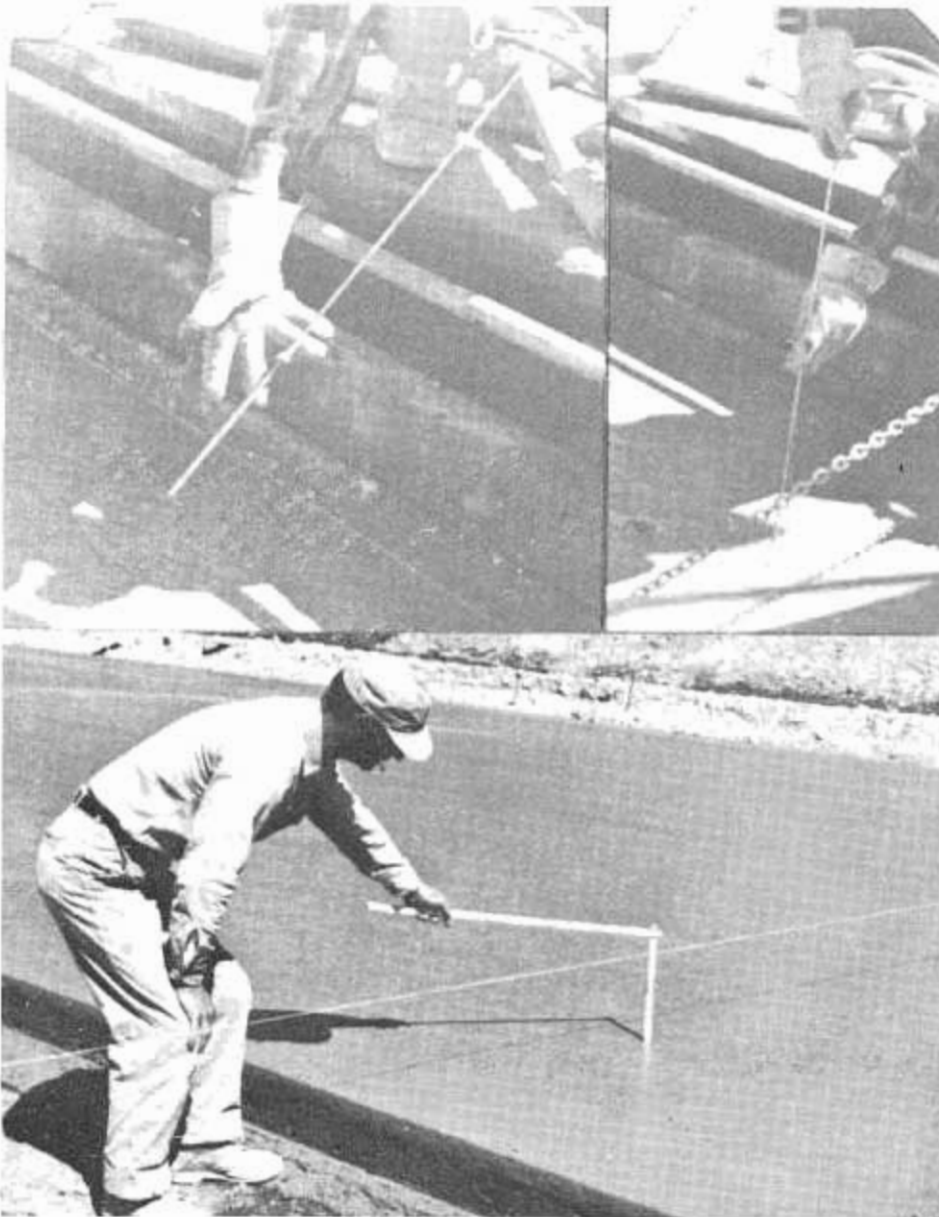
Measurement of pavement thickness is accomplished by two techniques as shown in the above photomontage. Measurement by stabbing with a steel rod is shown in top two photos. Measurement of completed surface by measuring down from a stringline is shown in the bottom photo.
